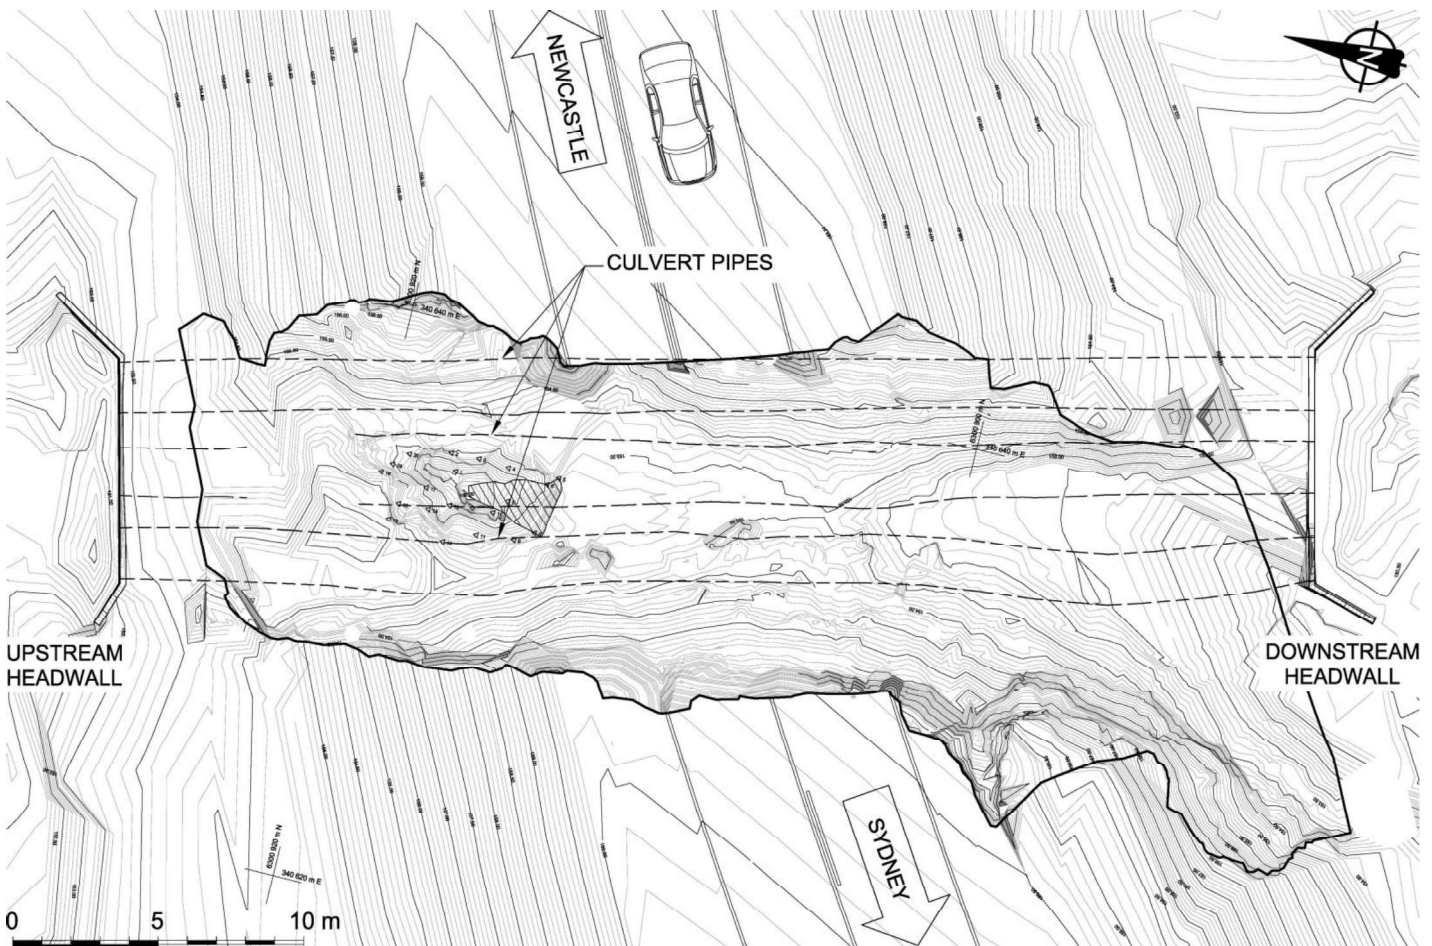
Plan view of the remaining road embankment and failure geometry at Piles Creek.
